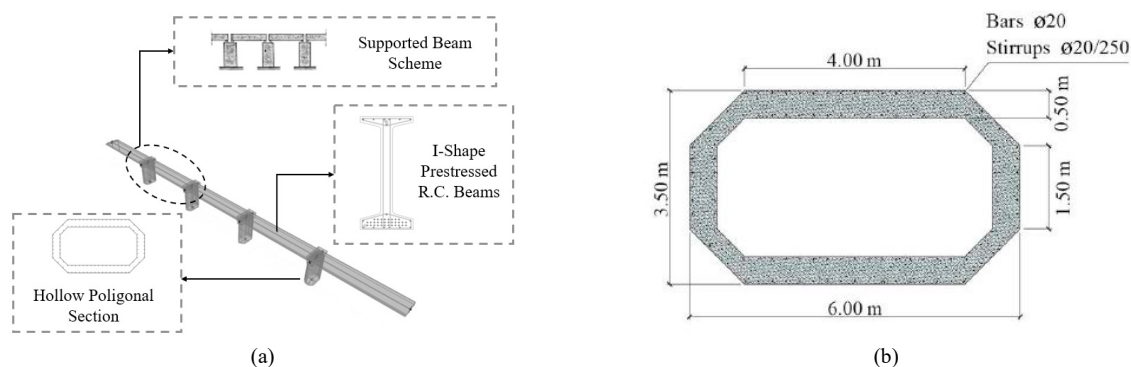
Italian Archetype bridge: (a) main structural elements (b) detailed pier geometry
